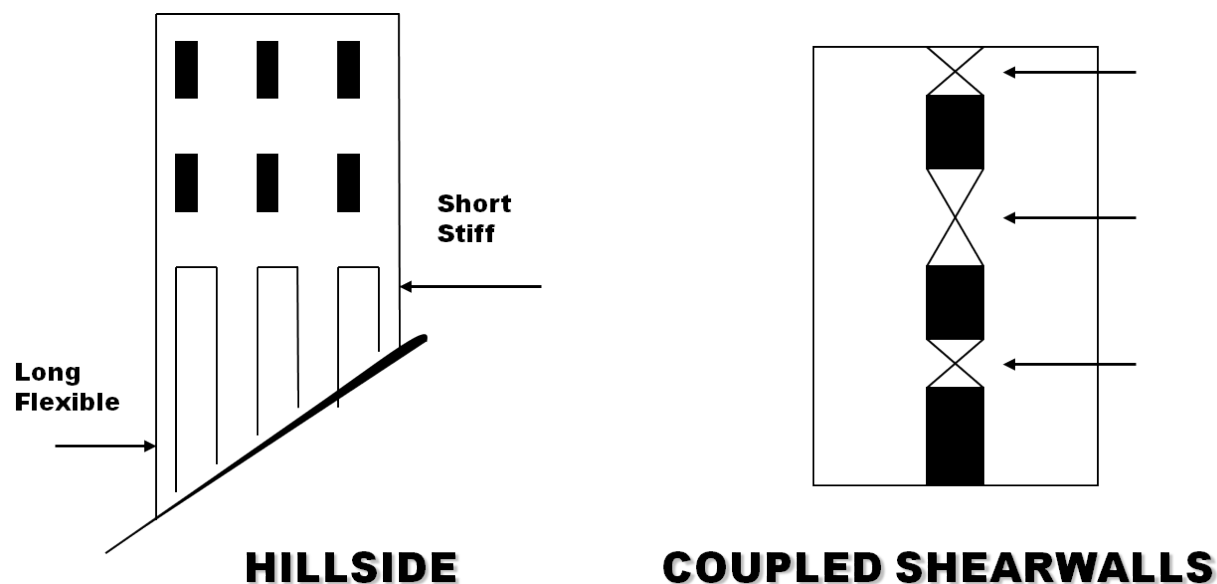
Hillside column illustration, and shear wall failure between wall openings. Diagrams courtesy ATC.
